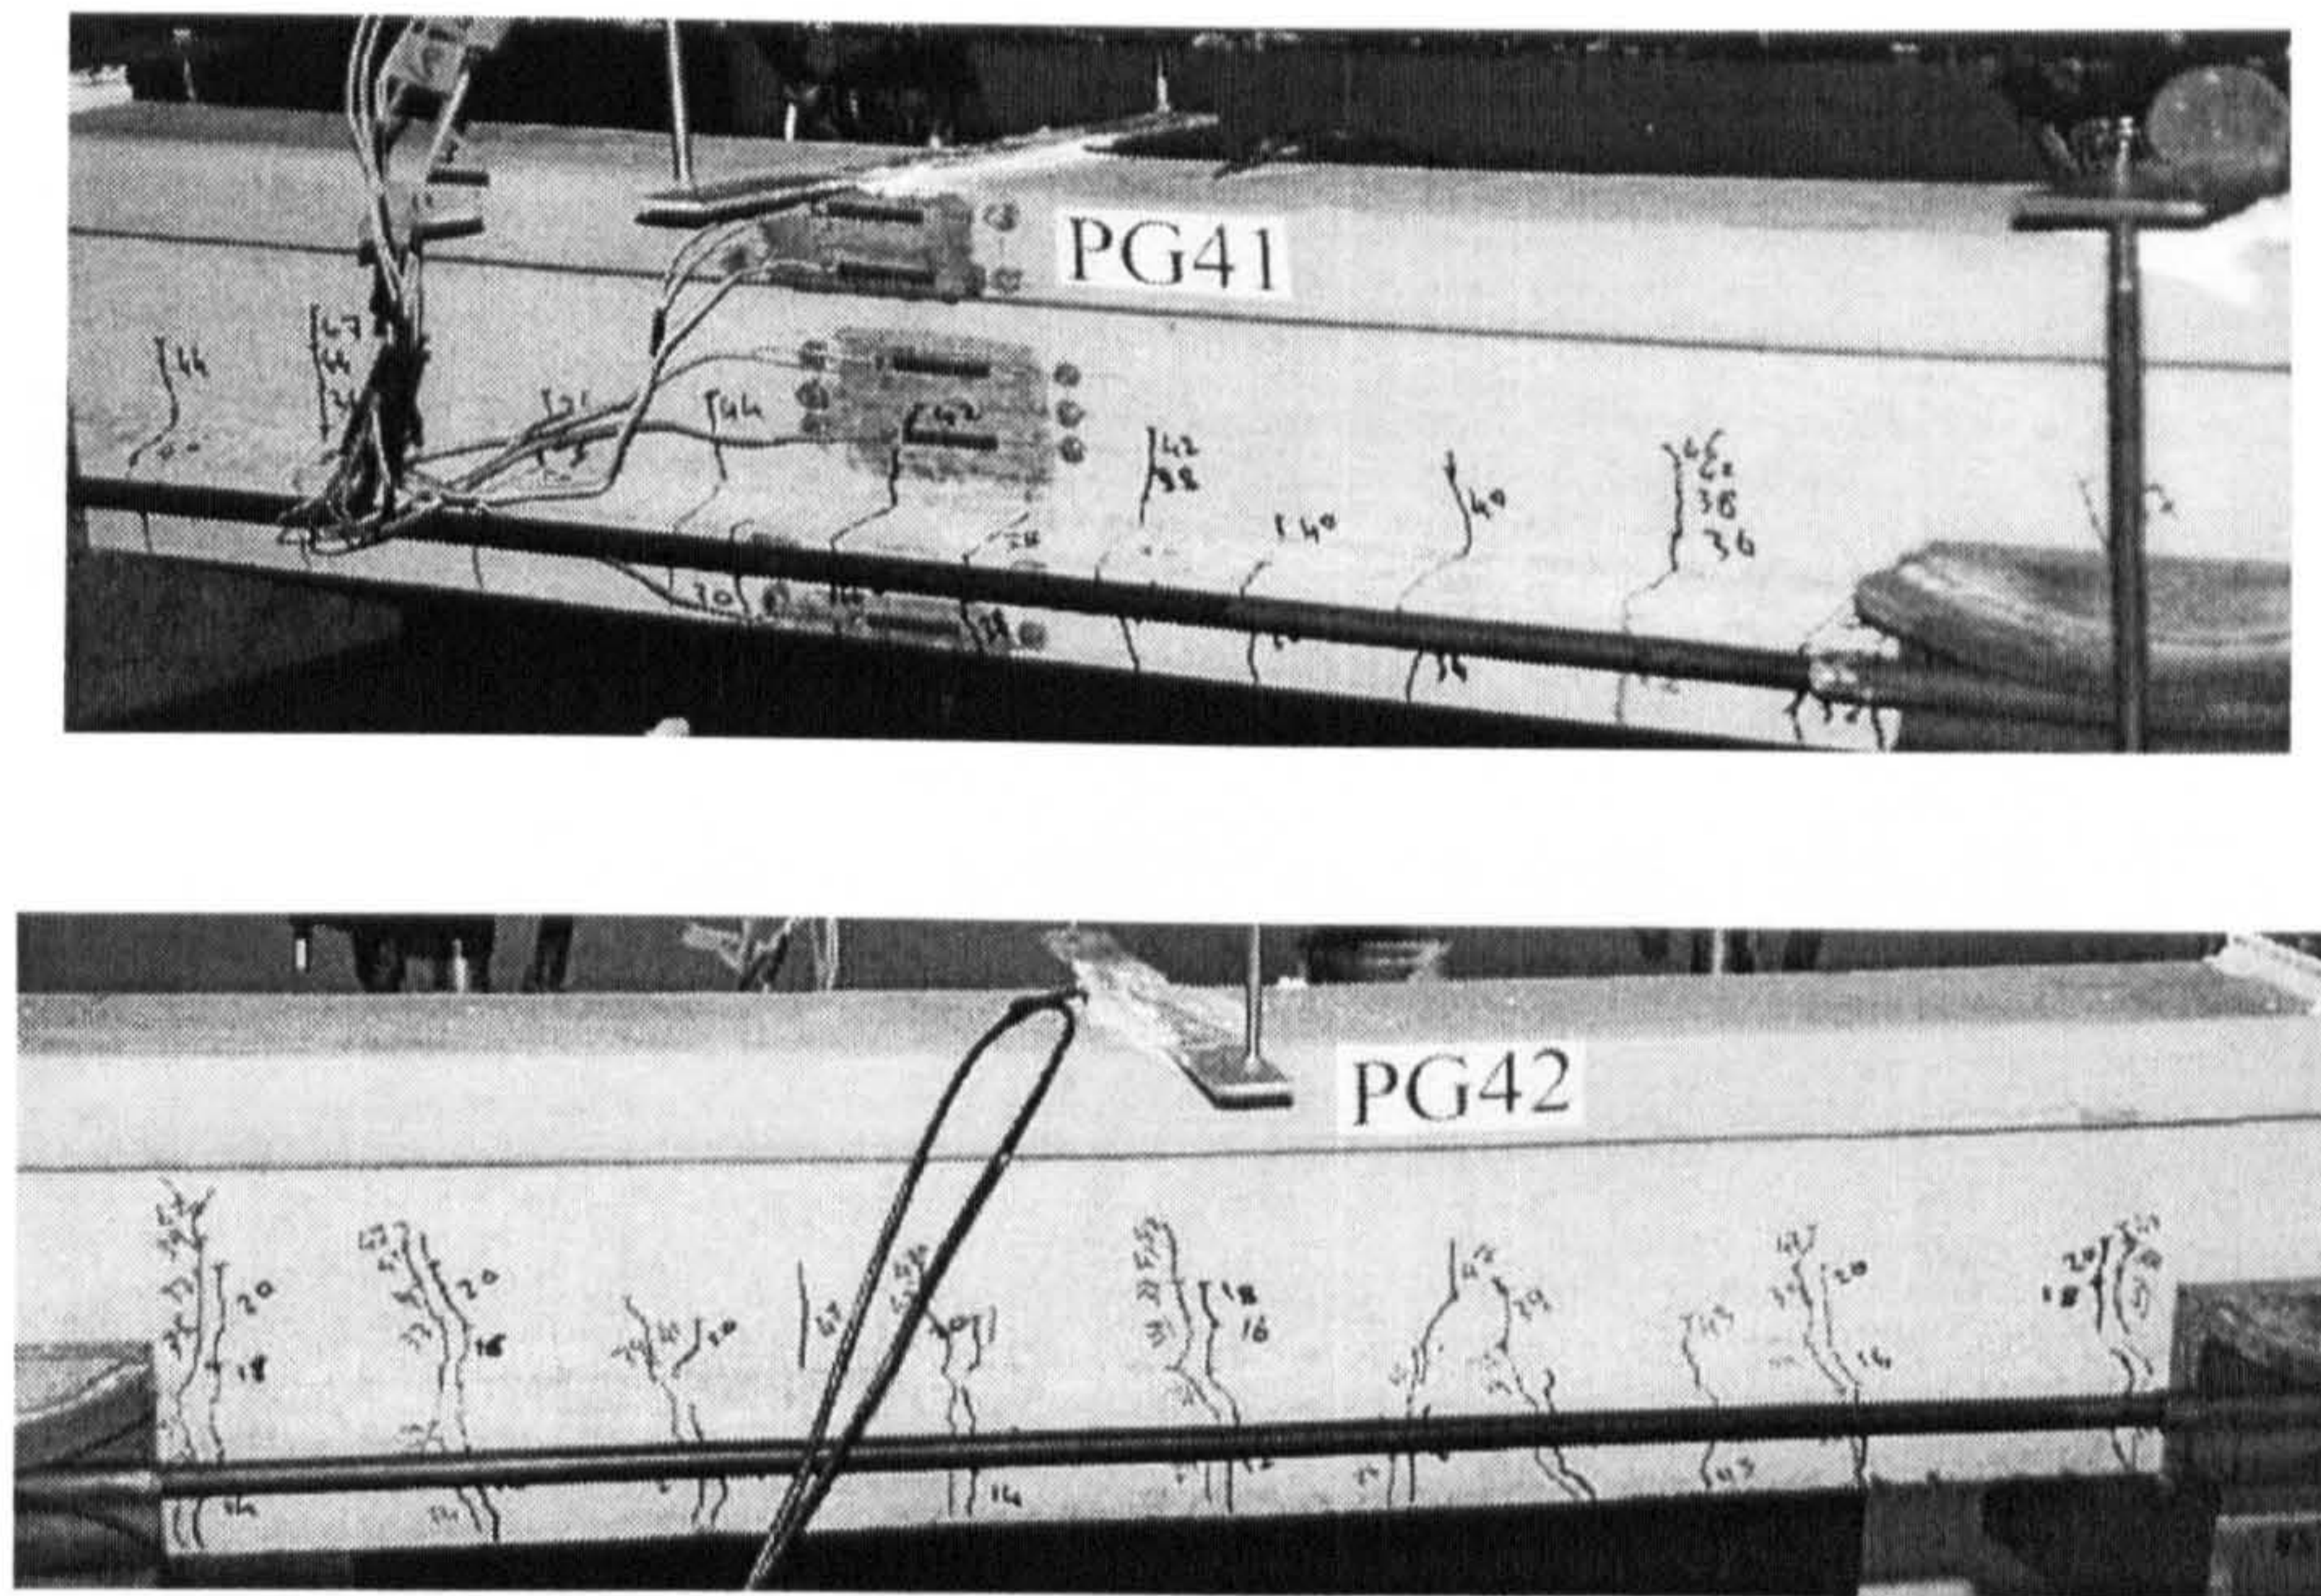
Flexural cracks pattern of beams PG41 & PG42 after external prestressing
